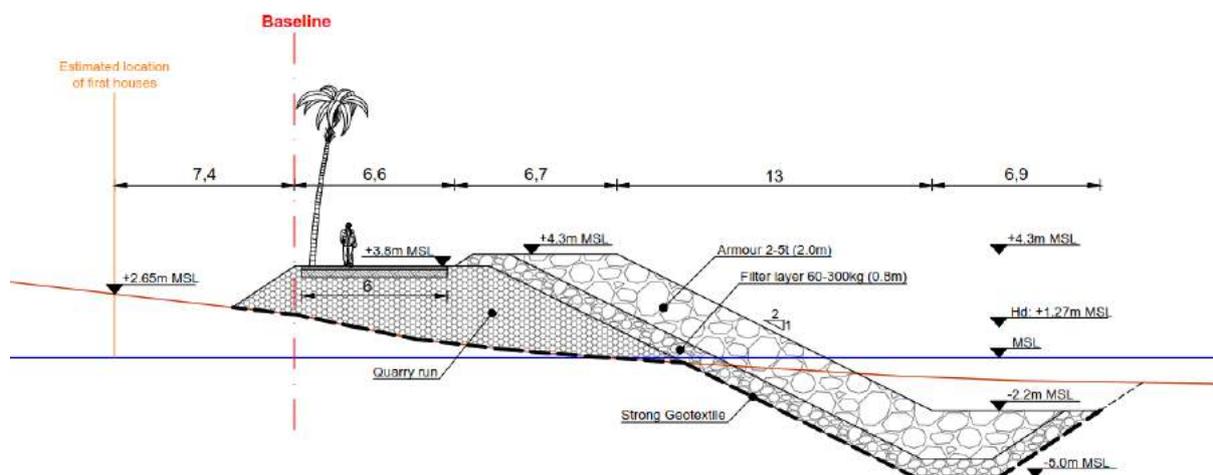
Principle cross-section Revetment West Point - Revetment Chainage 450
